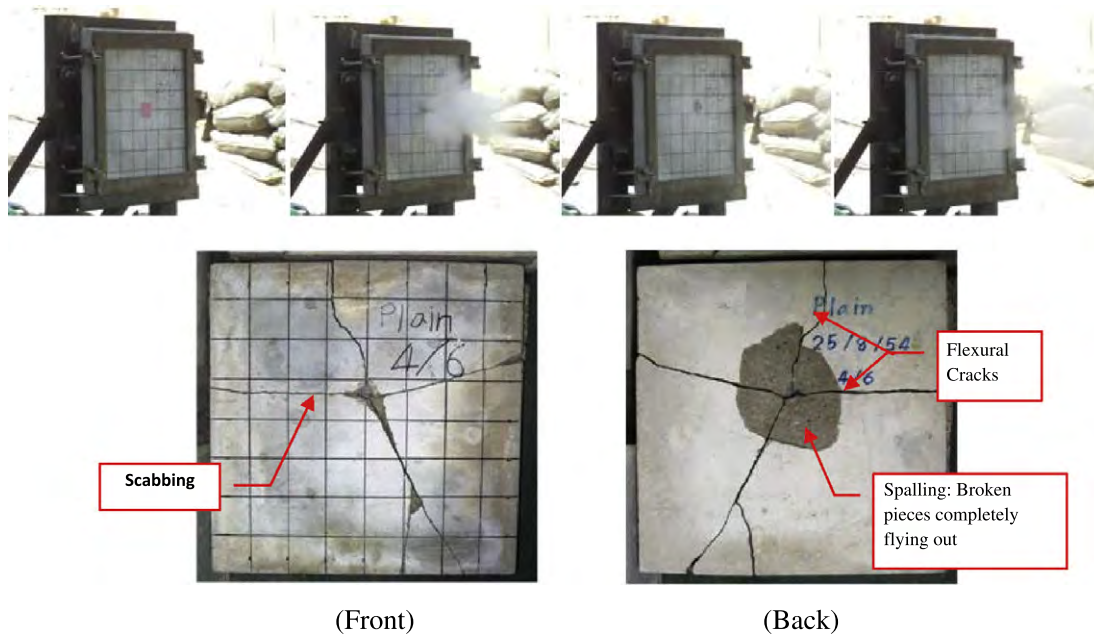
Failure patterns of single layer plain concrete panel.
